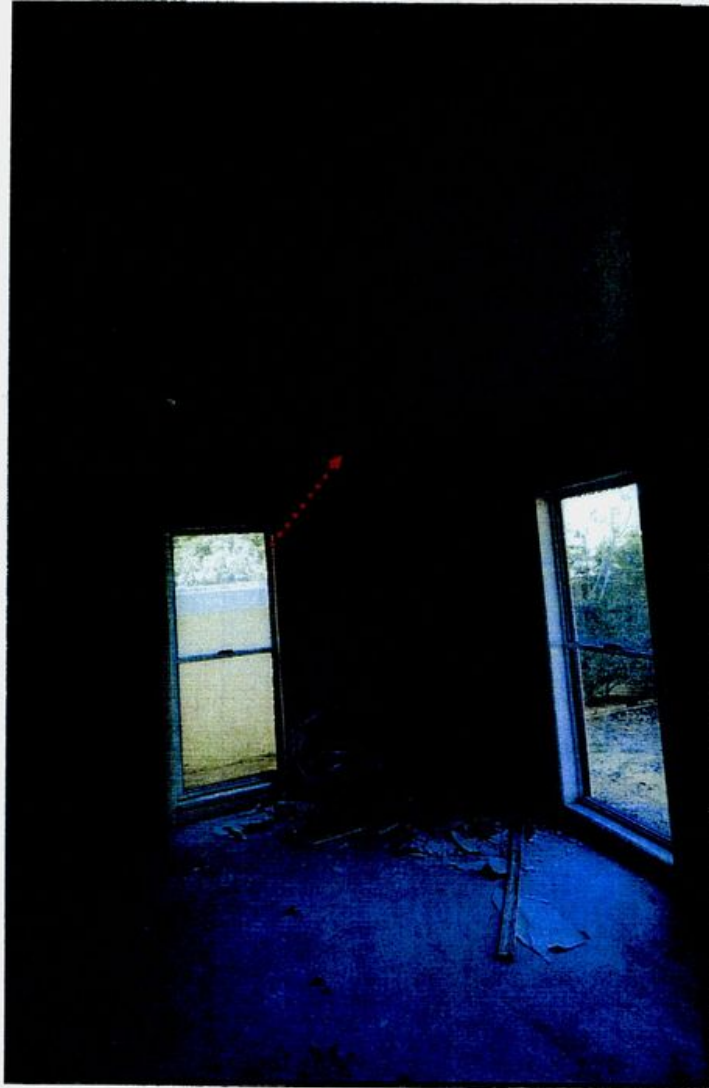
leaking of water through roof and ceiling of Study – see arrow.
